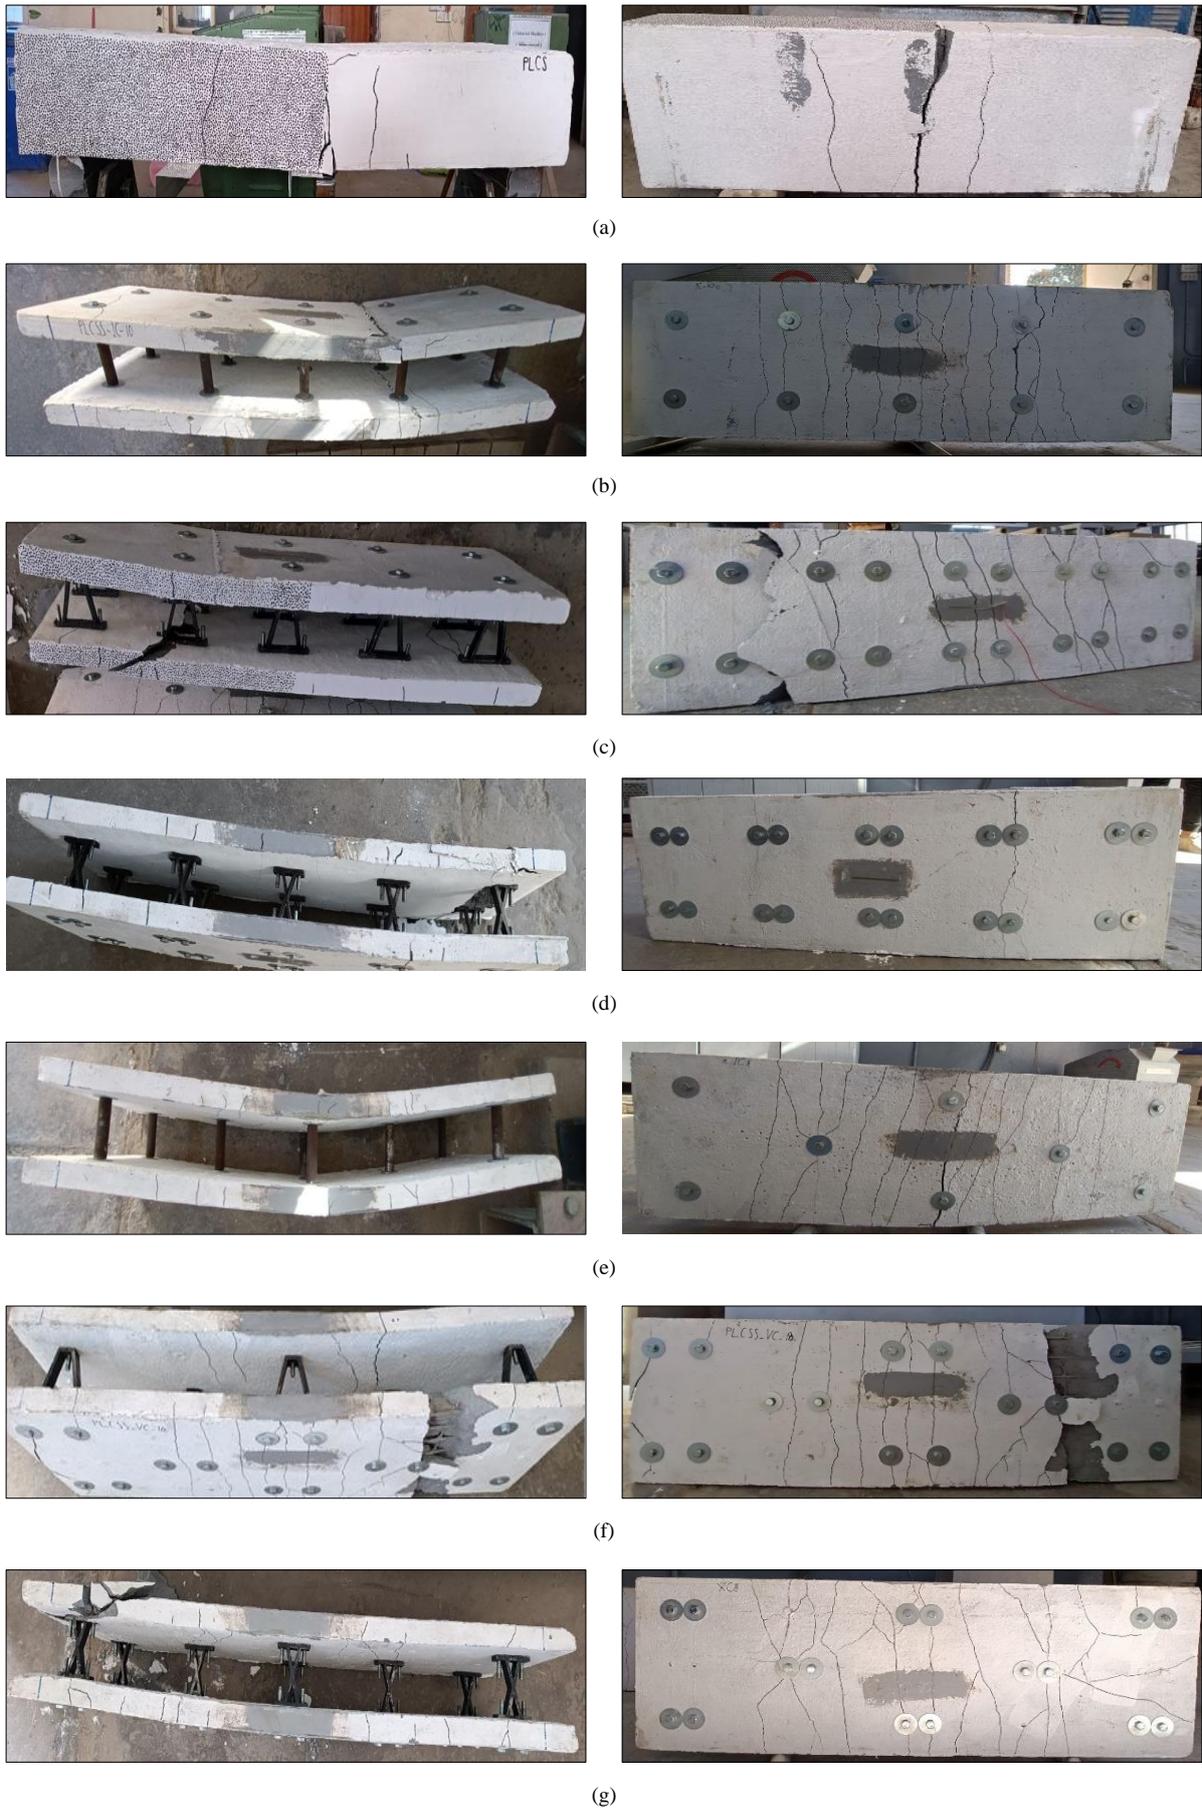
Crack Patterns at Side and Bottom View for: (a) PLCS ;(b) PLCSS-IC-10; (c) PLCSS-VC-10; (d) PLCSS-XC-10; (e) PLCSS-IC-8; (f) PLCSS-VC-8; (g) PLCSS-XC-8
